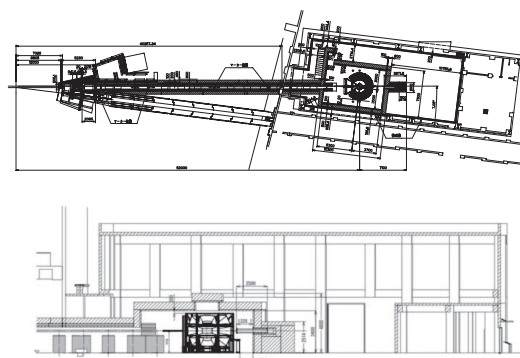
The ground plan of BL09 and the cross-section drawing of the experiment building for SPICA.
